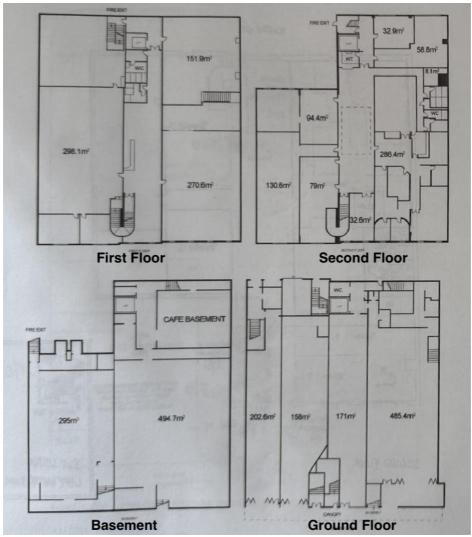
Current floor plans, 187-195 Rundle Street Adelaide
